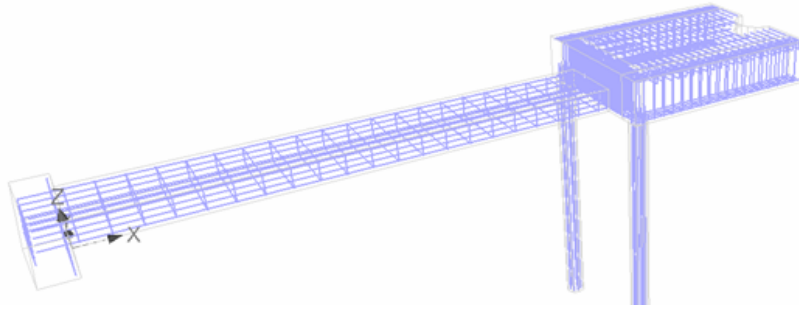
Numerical model of the reinforced concrete footbridge and part of the platform with reinforcement.
